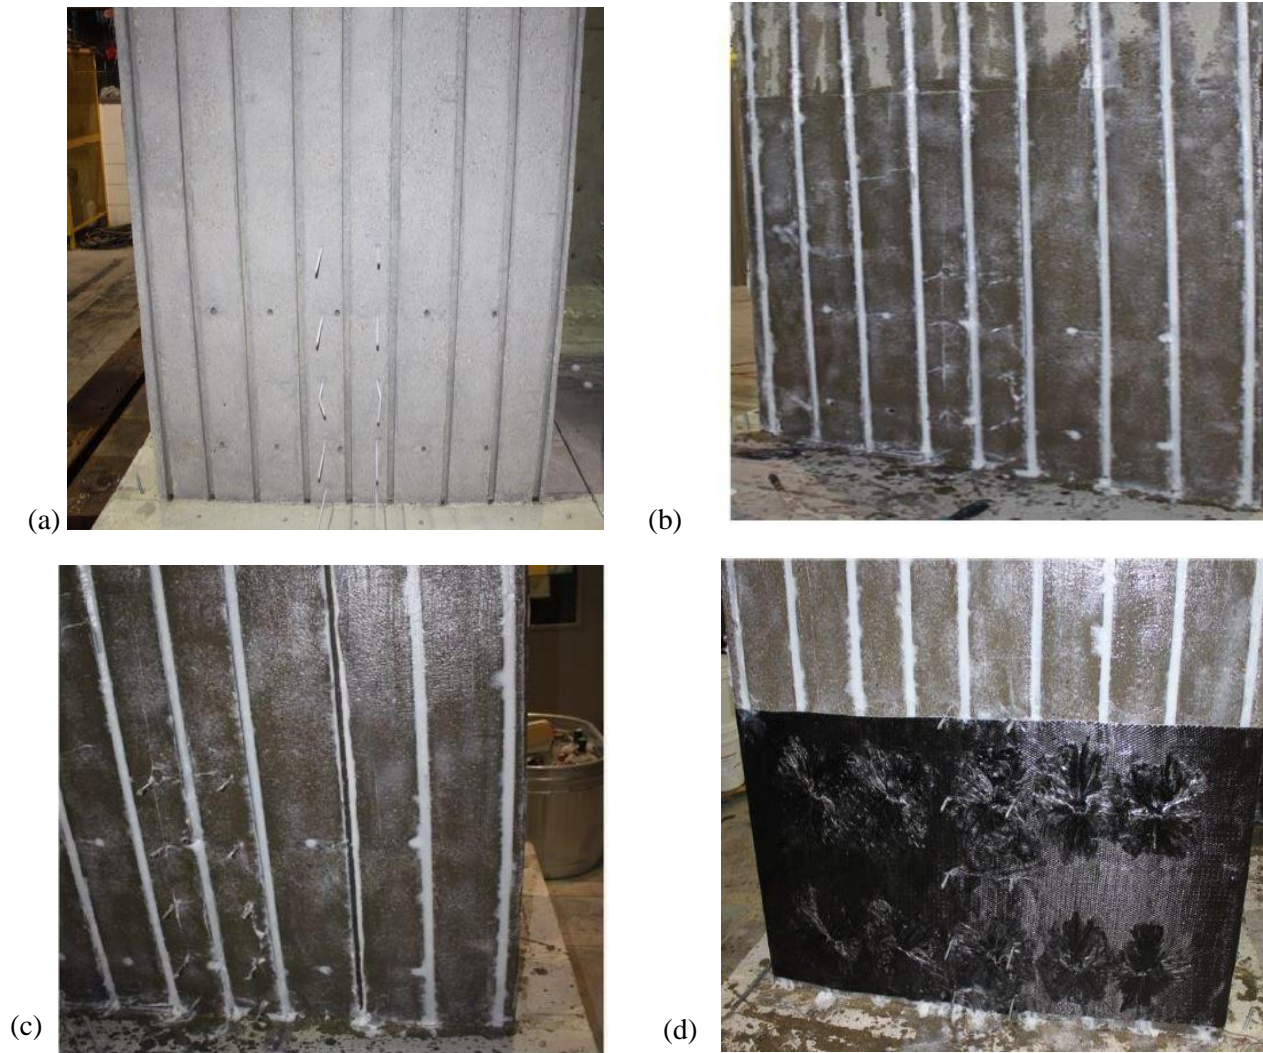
Retrofit process for specimen R2: (a) sandblasted surface, (b) application of premixed epoxy, (c) installation of CFRP NSM rods, (d) CFRP wrap and installation of CFRP horizontal anchors
